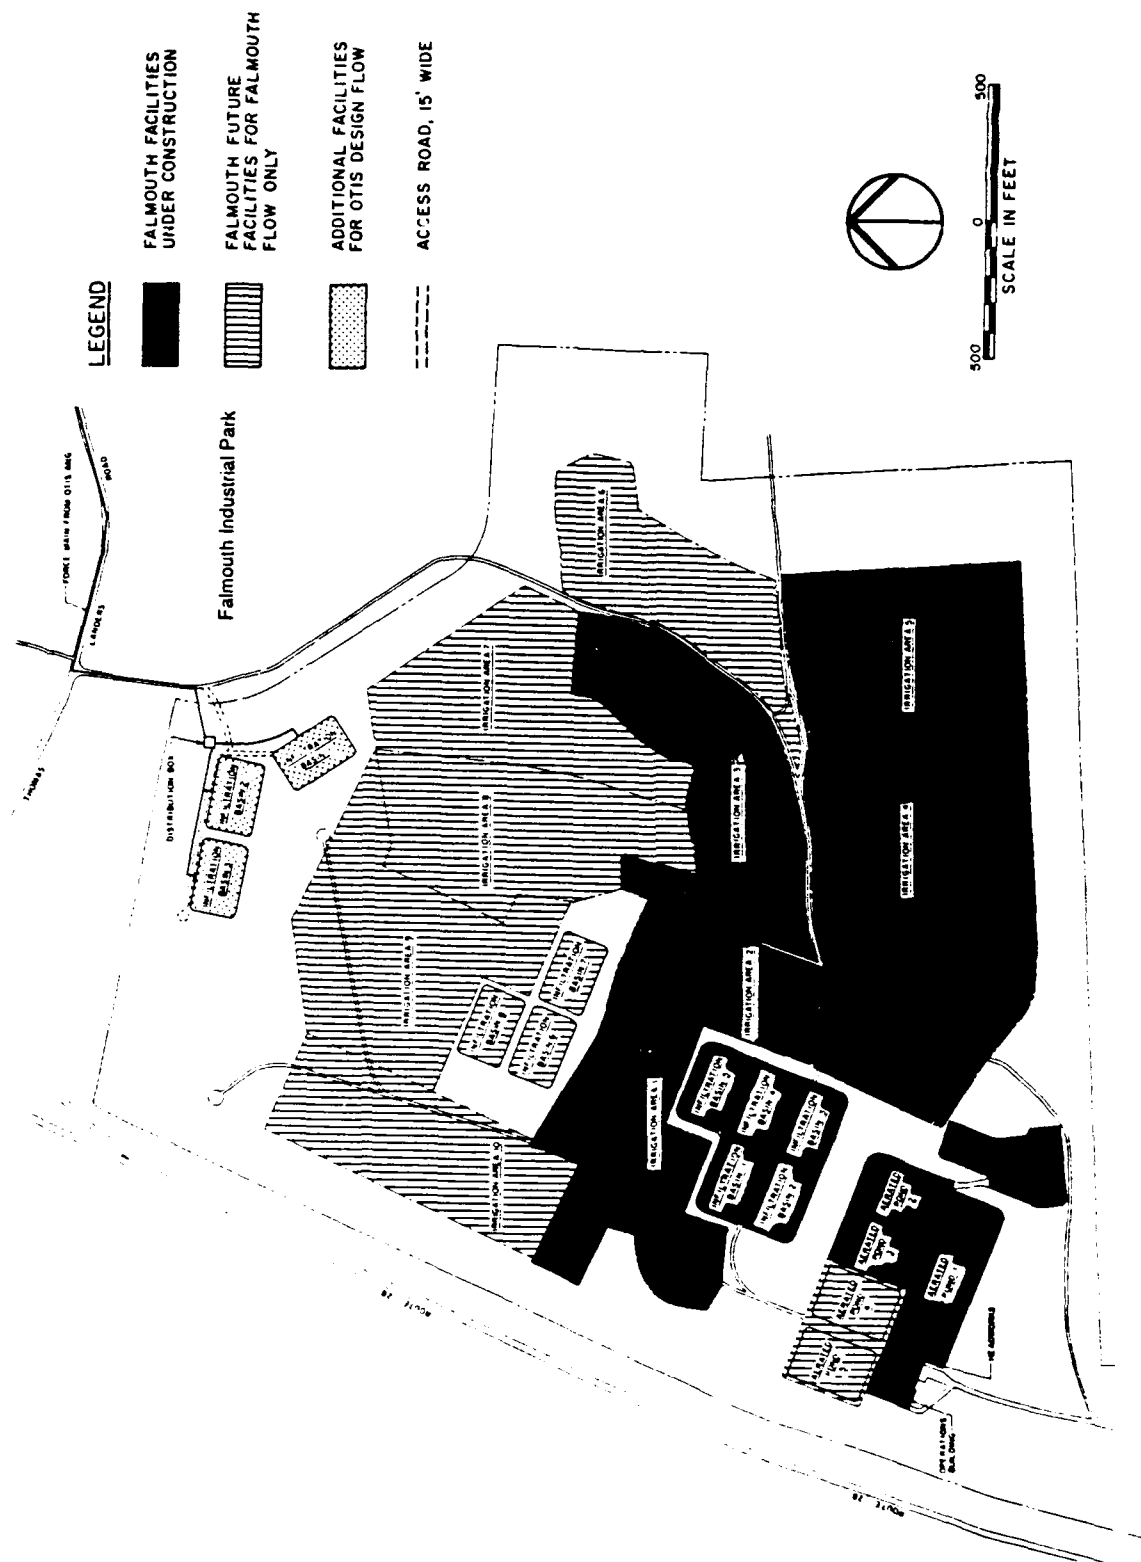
Site Layout for Falmouth WWTP under Alternative 1a
